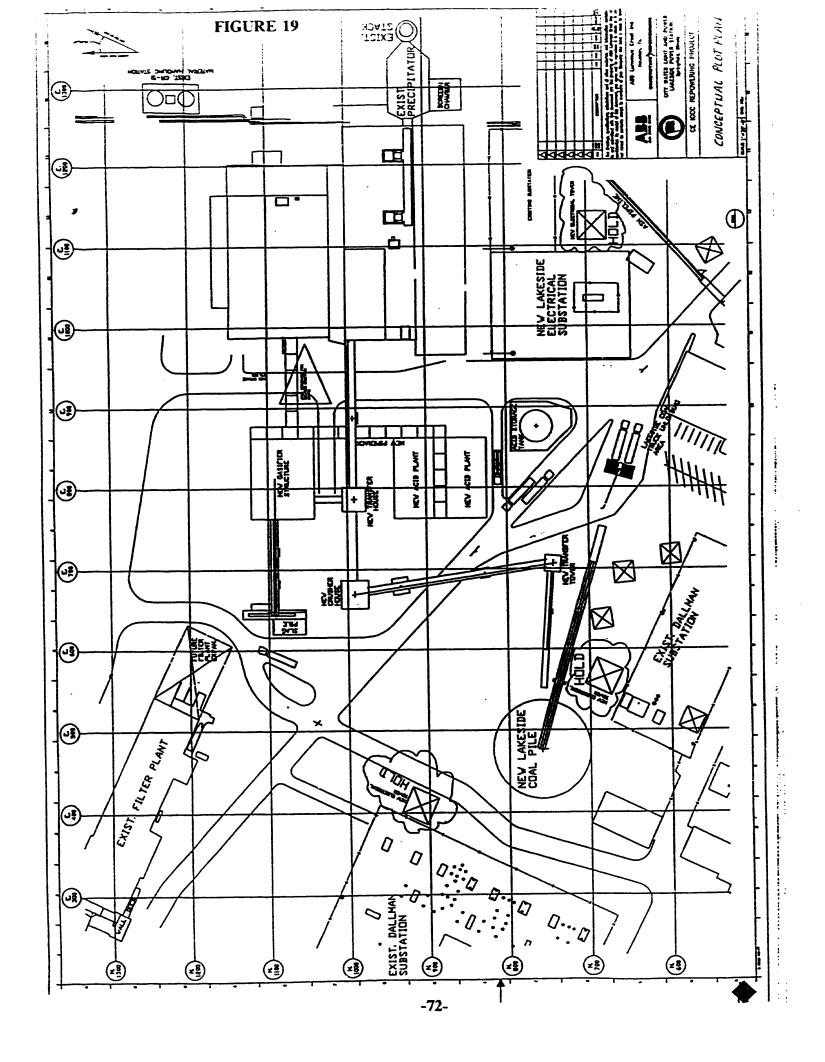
shows a conceptual plot plan of the site. Figure 20 shows an isometric view of the plot plan which makes it easier to visualize the installation.
